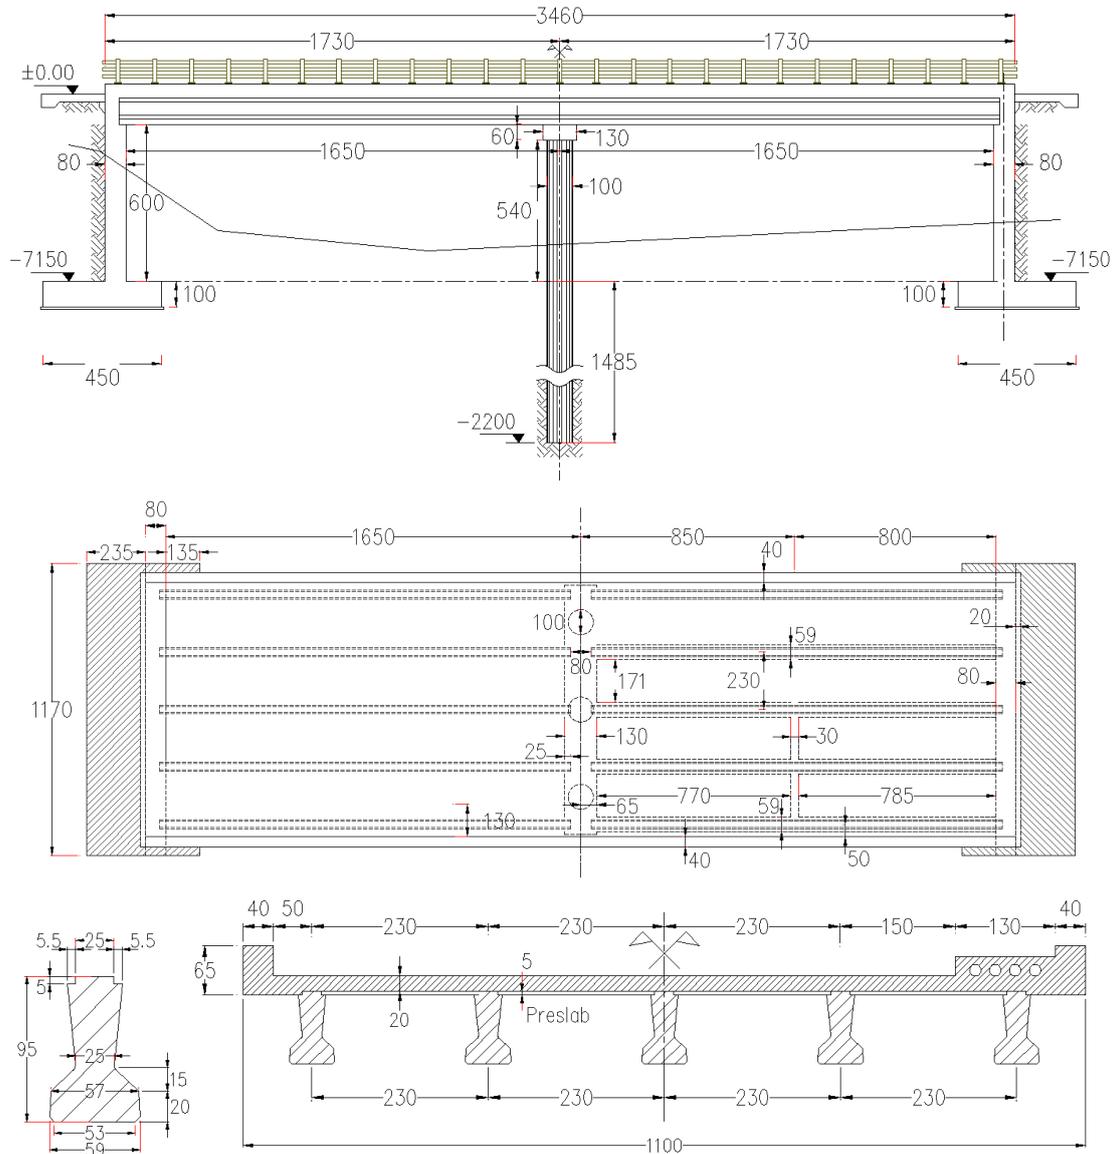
Geometrical dimensions and cross sections of the bridge (Dimensions are in cm)
